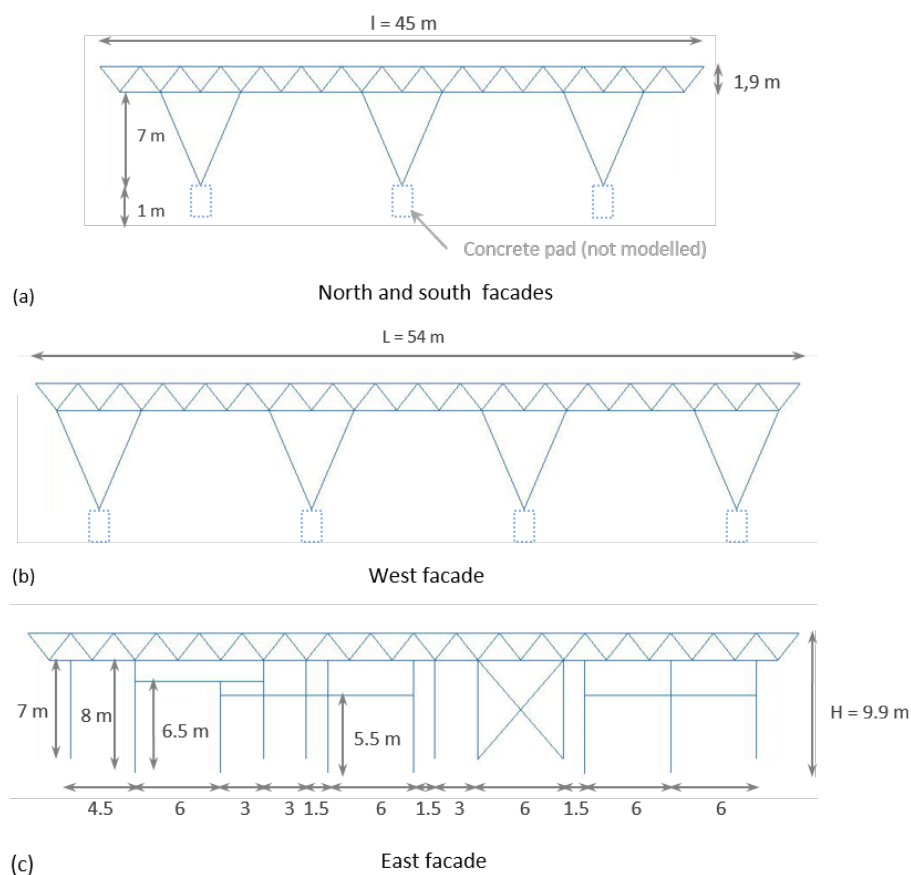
Sketches showing the geometrical details (size and shape) of the metallic structure of every facade of the Irstea Cévennes building.
